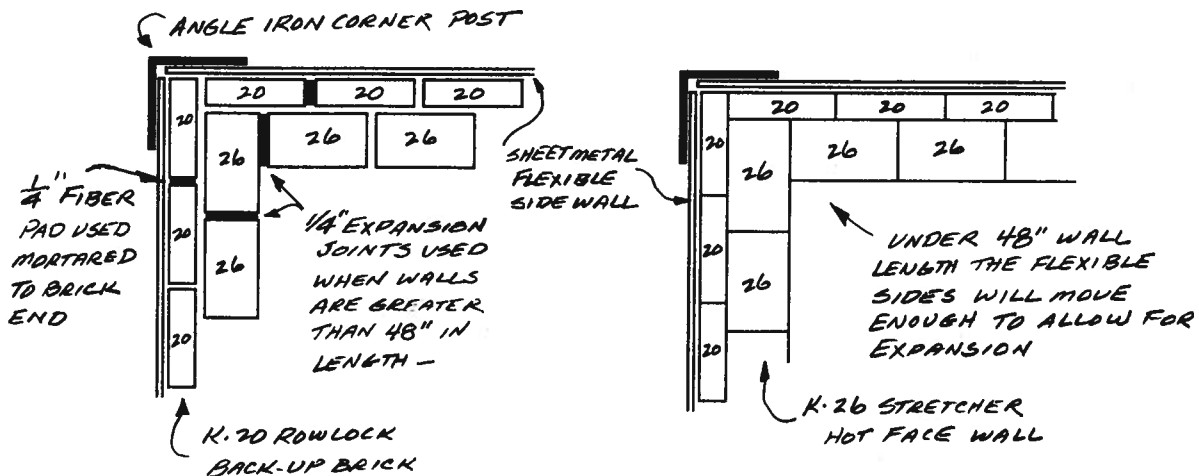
32: Expansion joint is eliminated in an IFB kiln with steel framework, with a wall 4" or less.
